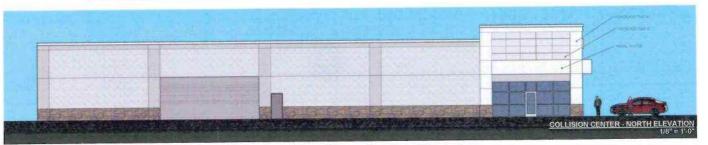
## EXHIBIT "C" LAND USE REGULATIONS ELEVATIONS PLAN ORDINANCE #16-05-05-15
